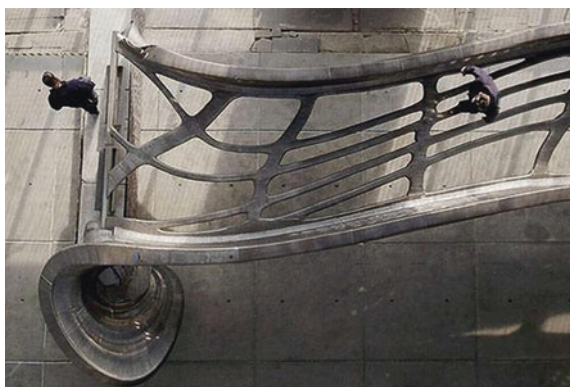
MX3D Bridge. (Photo by Joris Laarman Lab)
